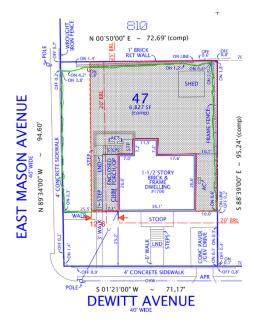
Area that can be enclosed with a 6.00-foot fence by right shown shaded
